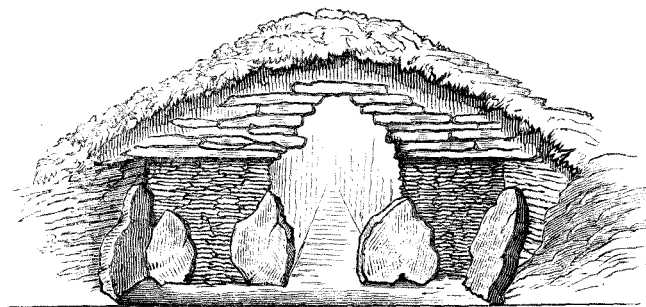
Transverse Section of Gallery and Chambers, Stoney Littleton.
